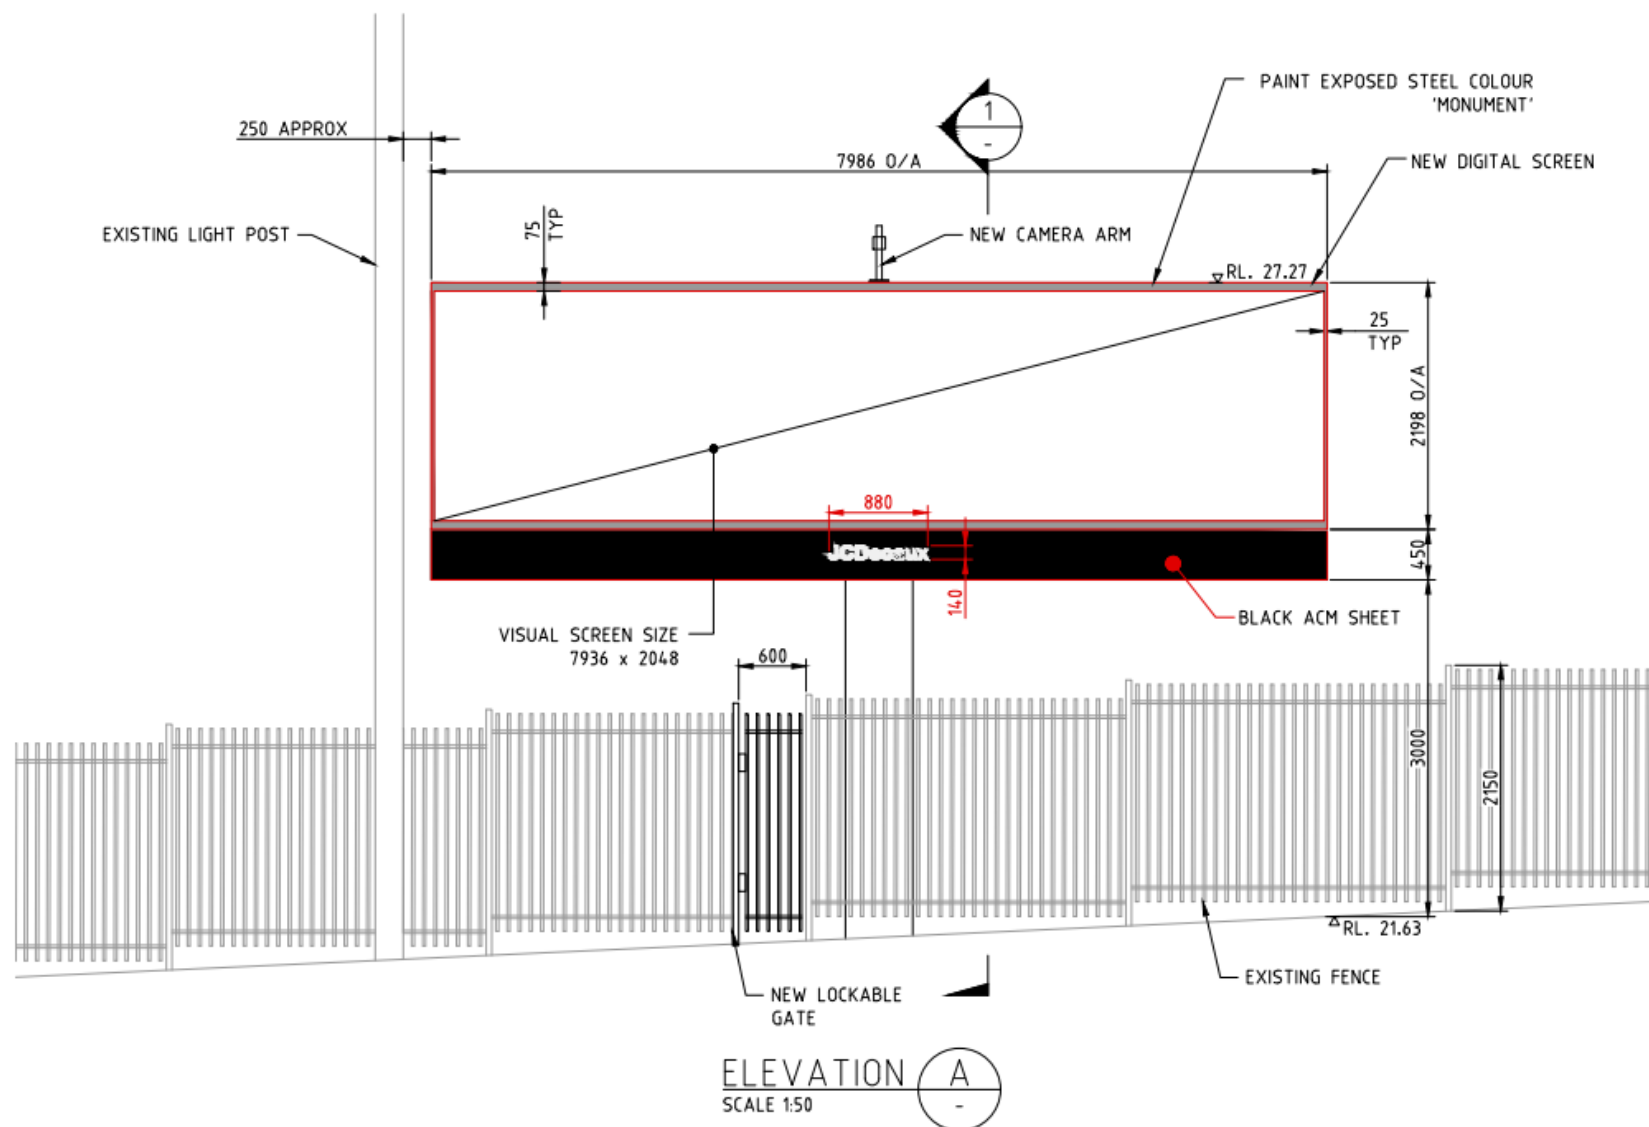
Elevation (Dennis Blunt Consulting Engineer, 2023)
